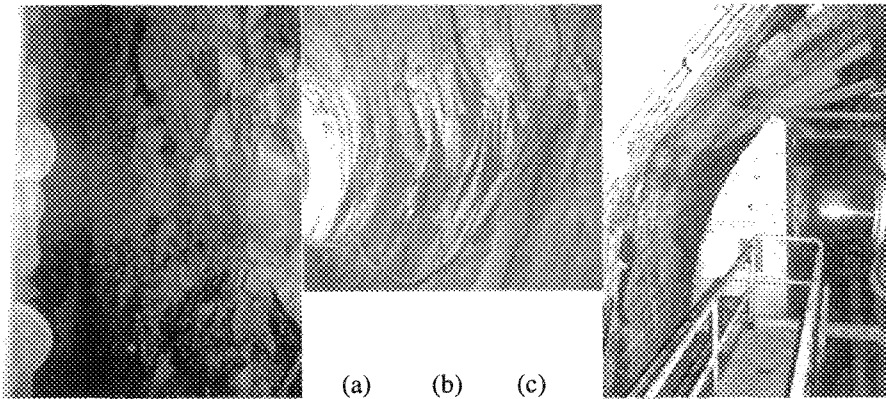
Spalling and blocky rock masses at the Löttschberg Base Tunnel.
